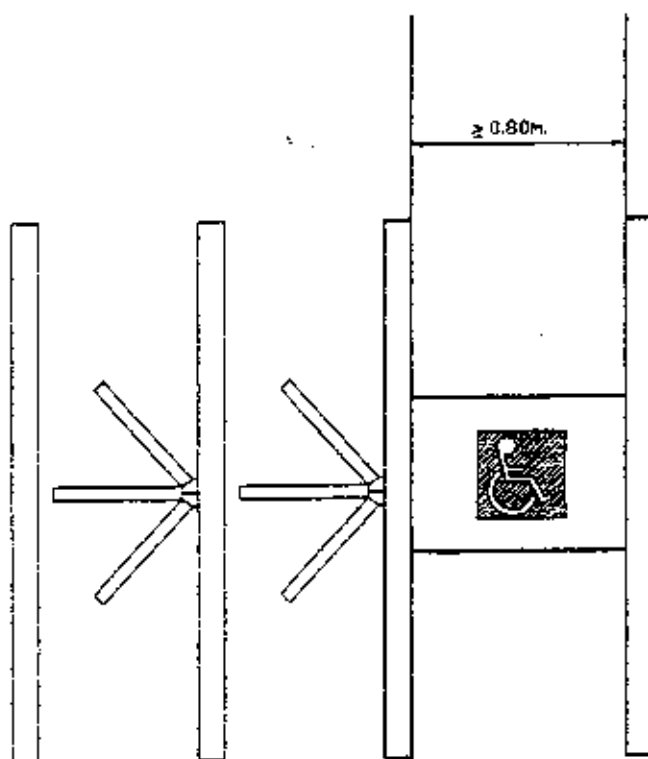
FIG. AREAS SET FOR DISABLED IN PLACES OF ASSEMBLY
